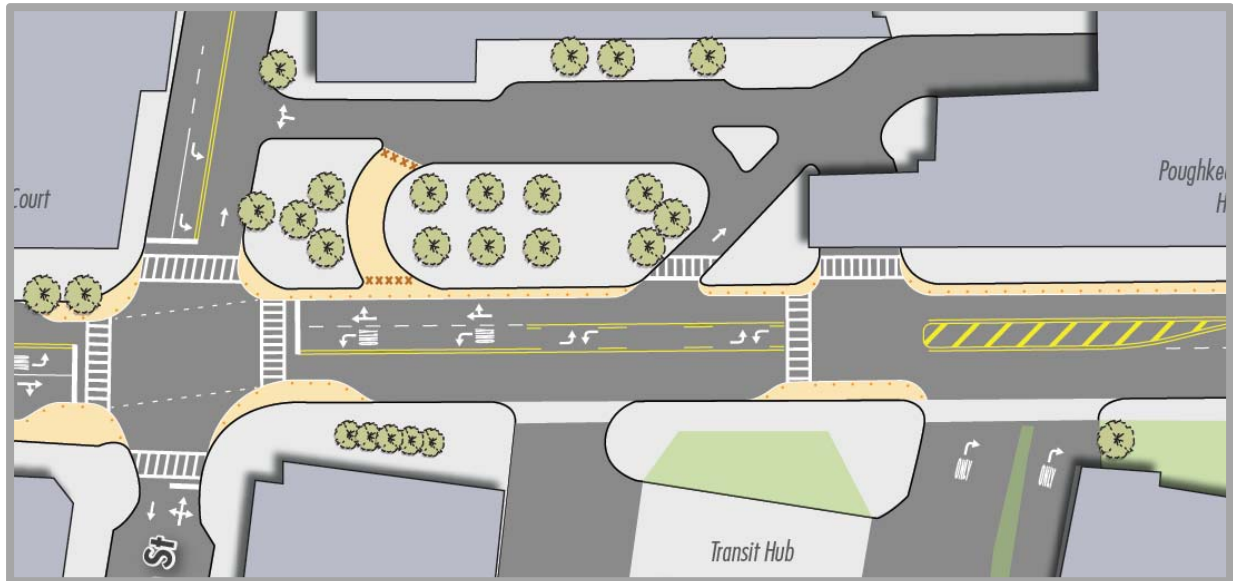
Intersection of Civic Center Plaza and hotel/transit hub driveways in a two-way Market Street scenario.
